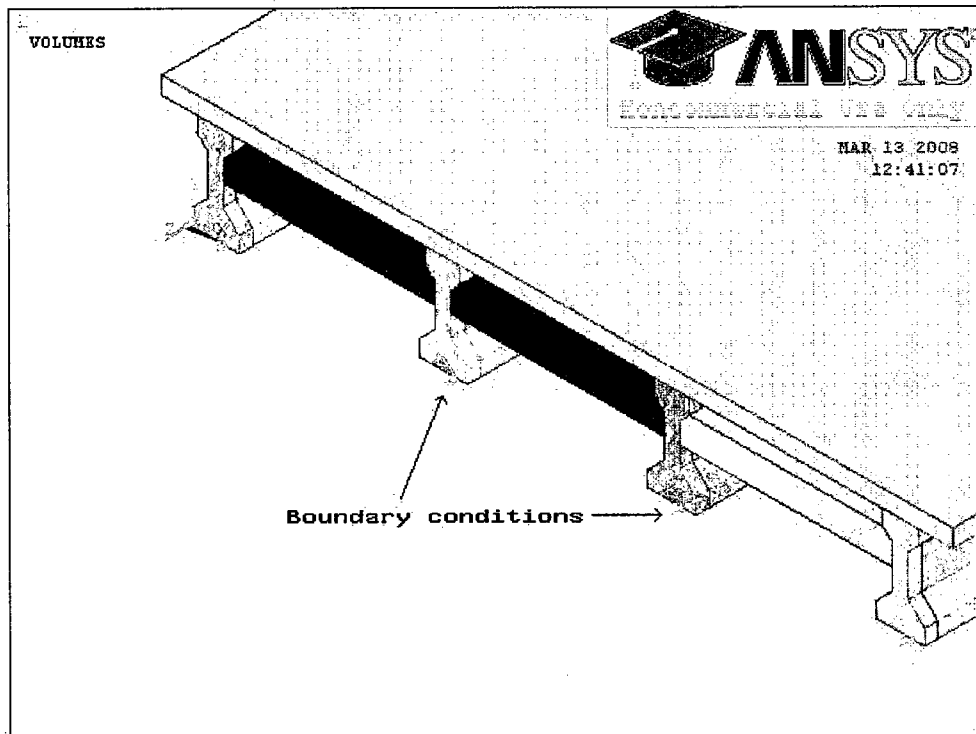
Restrained Supports between Girders and Sub-structure.
